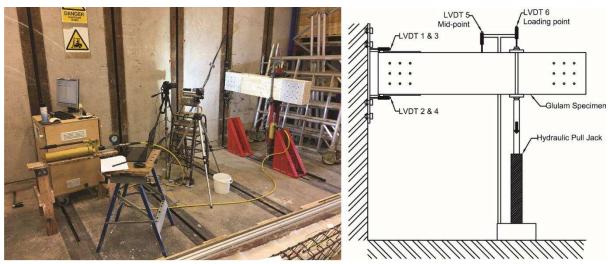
Moment-resisting connection test set-up (left) and locations of the LVDTs (right).
